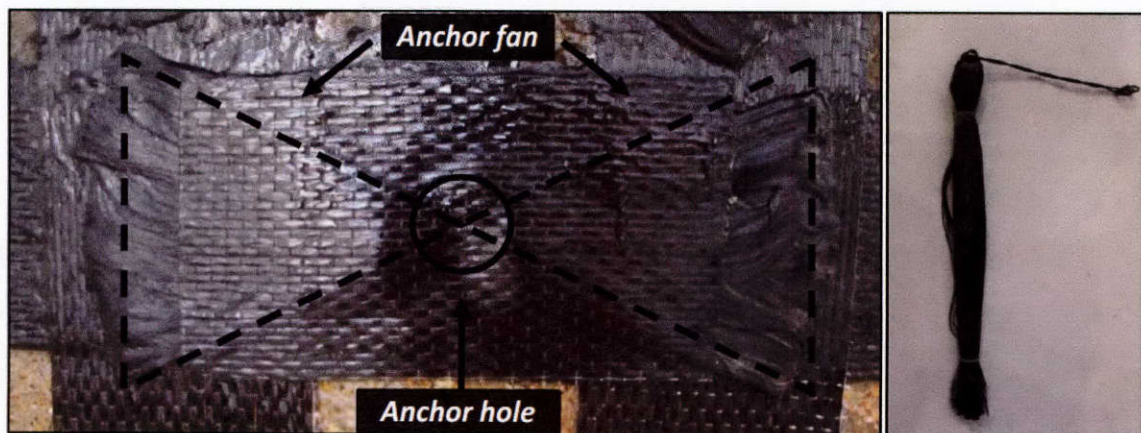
Middle anchor detail (left), CFRP anchor (right)
